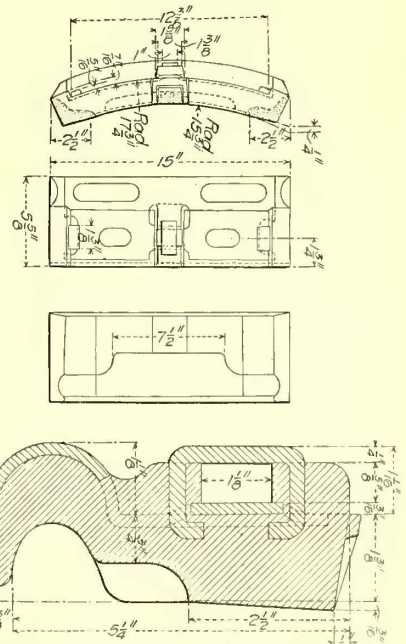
Present Subway Motor and Trailer Shoe of Steel Back Type, Center Chill, with Toes Cut Off
